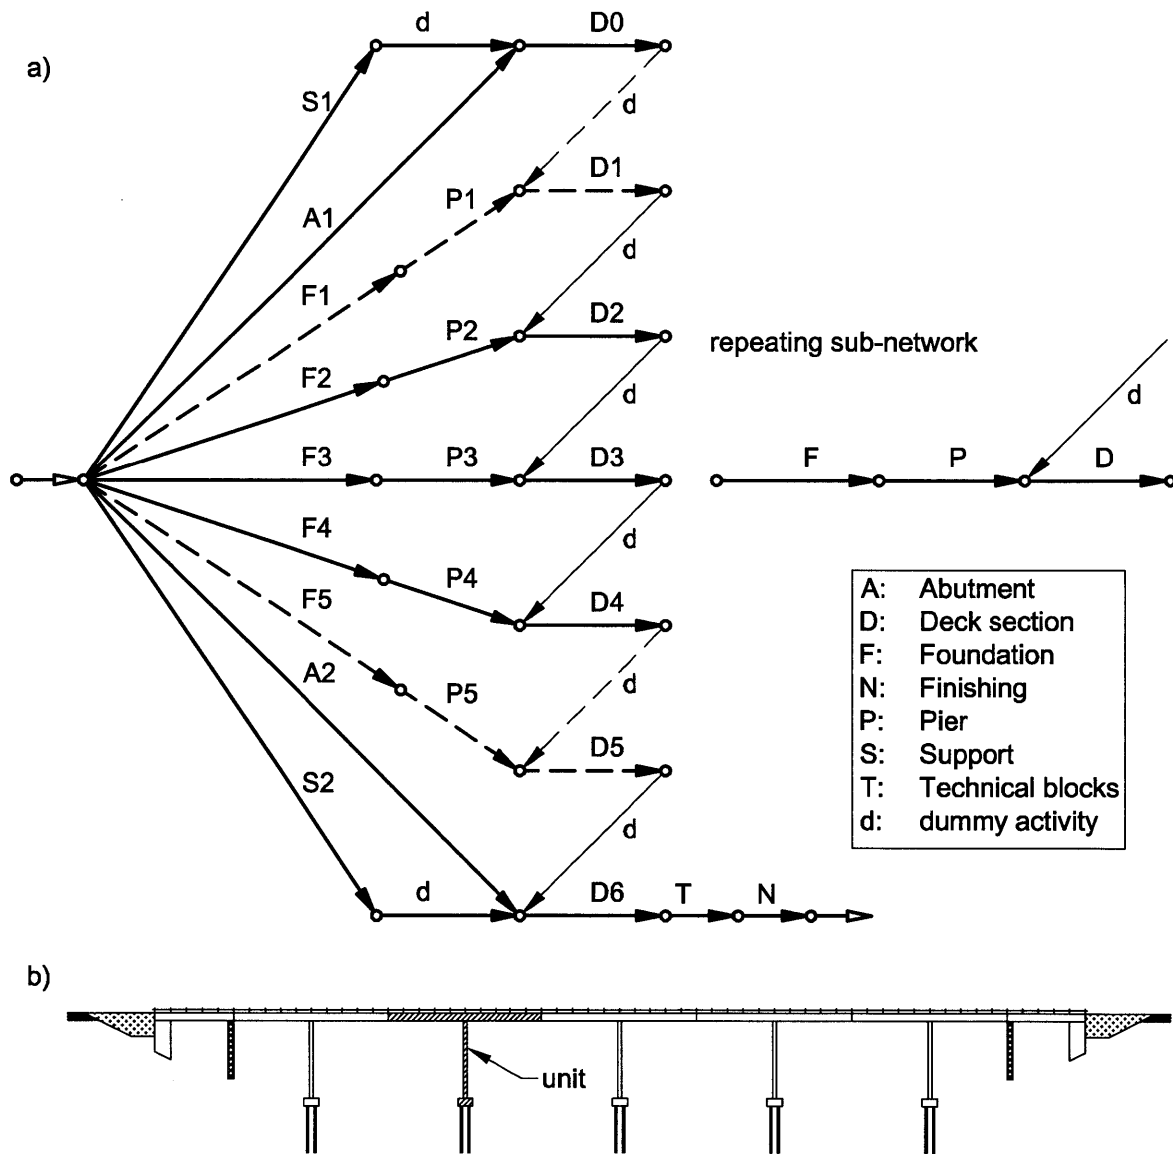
Balanced cantilever construction method: a) activity network and repeating sub-network of b) a six-span viaduct. The repeating sub-network models the construction of a unit (dashed in b) including the foundation (pile set and footing), the pier and the deck section. In the activity network the sub-network is repeated five times, the number of the units in the viaduct (the first and the fifth repetitions of the sub-network are dashed in a).
